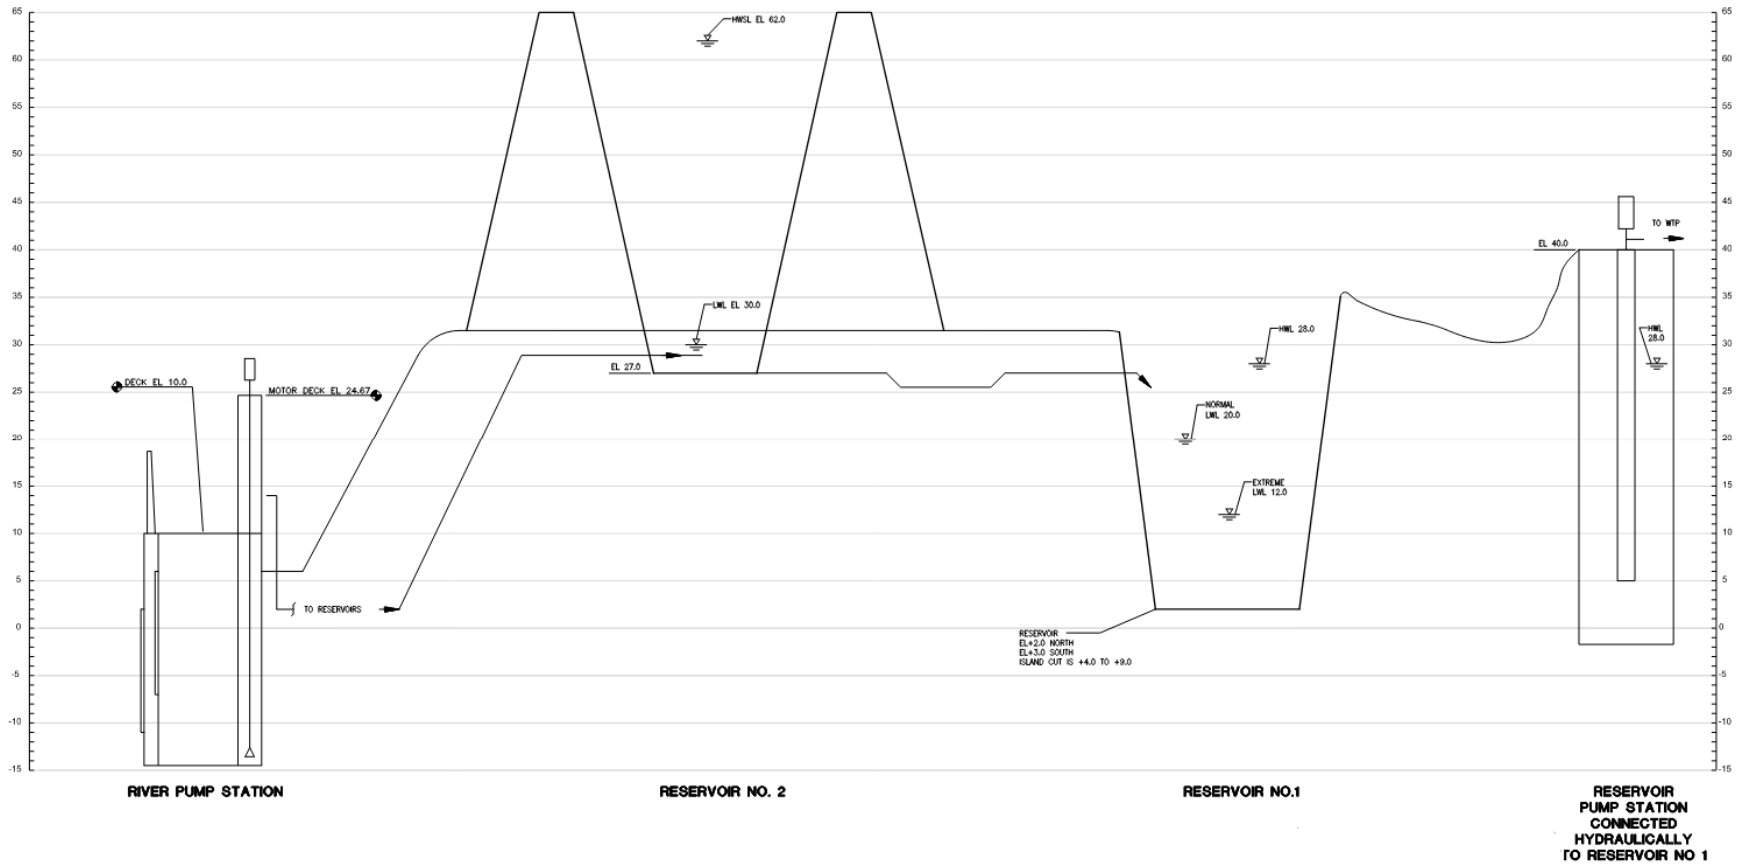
Hydraulic Profile – River Pump Station to Reservoir Pump Station
